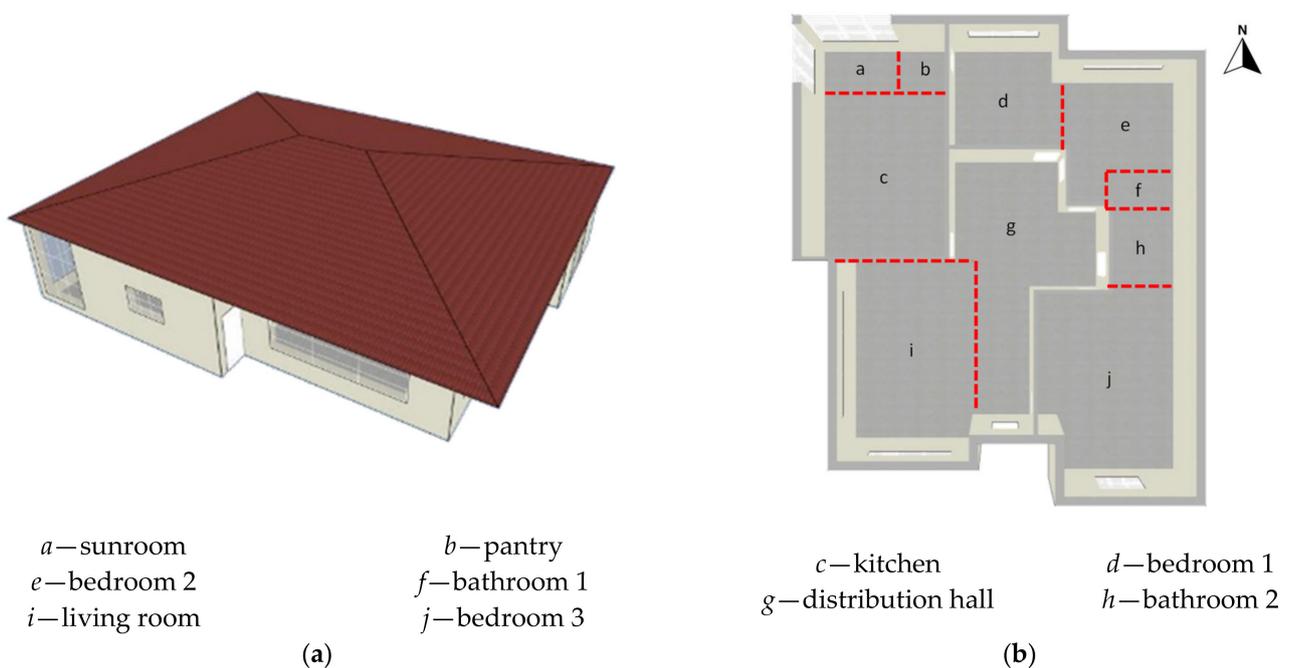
Rendered images of the case study building: (a) 3d model; (b) ground floor blueprints.
